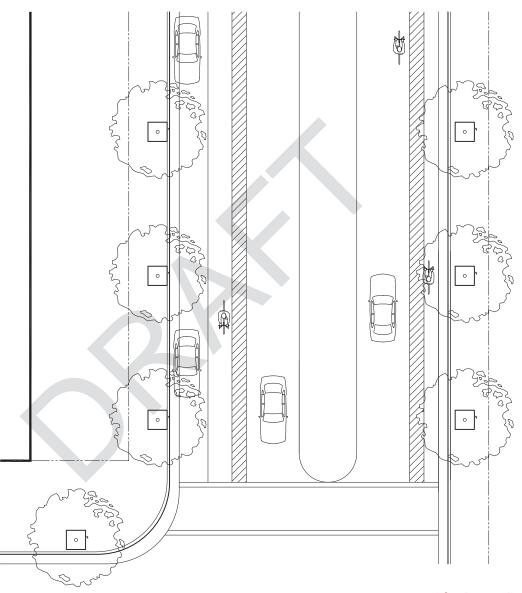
Street Type 4.1: Typical Intersection (Plan Perspective) [Update pending]
